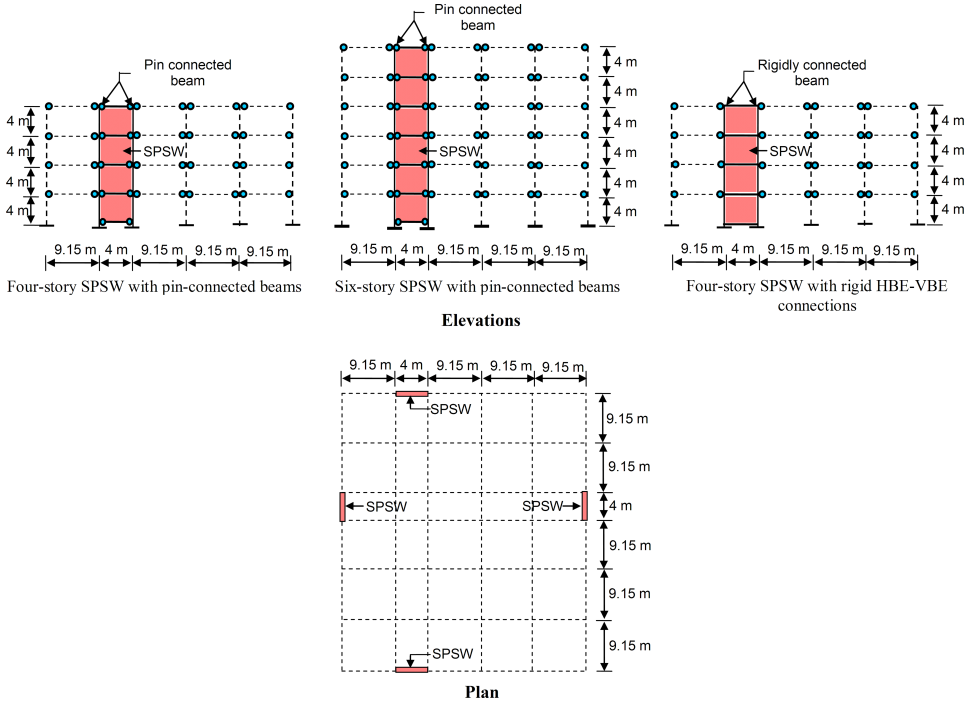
Plan and elevations of the three study buildings showing the SPSW locations and connections.
